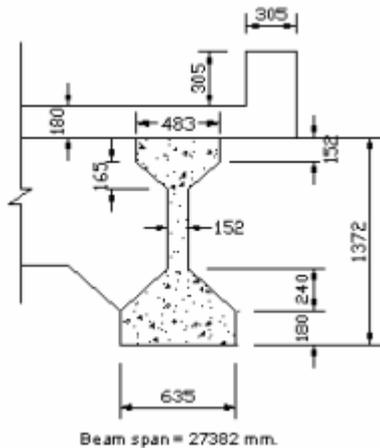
SECTION DETAIL OF PRE-CAST CONCRETE BEAM (SETUNGE ET AL., 2002)
